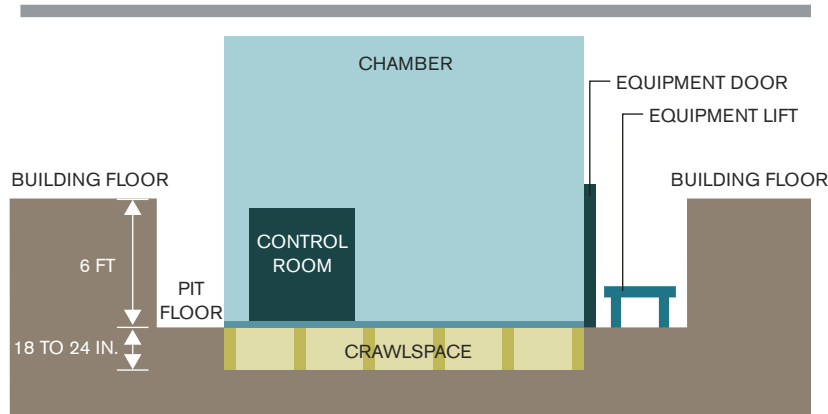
One chamber design needed a 6-foot pit to clear a building's ceiling.
